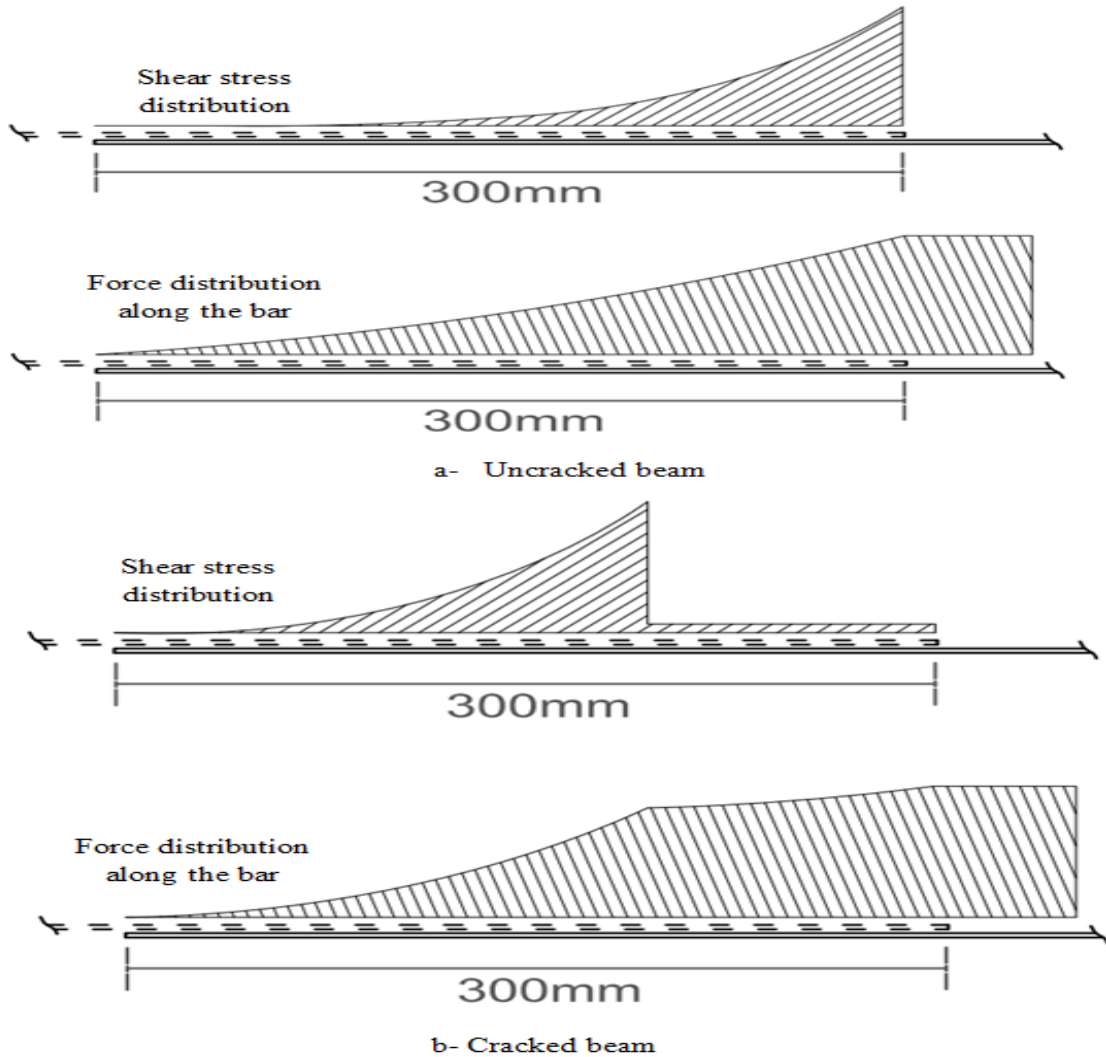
The shear stress and the force on the bar distributions along one bar of a lap splice for a cracked and uncracked beam
